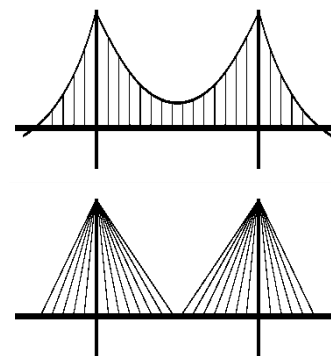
Suspension Bridge & Cable-Stayed Bridge
